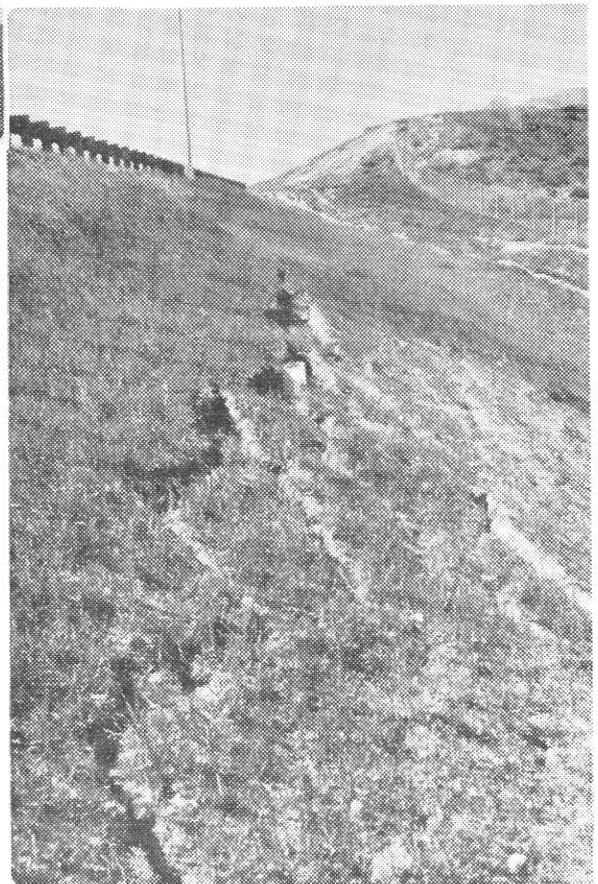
Transverse pavement crack on Connector C-Y. (Light standard is same as shown in Photo 65.)
